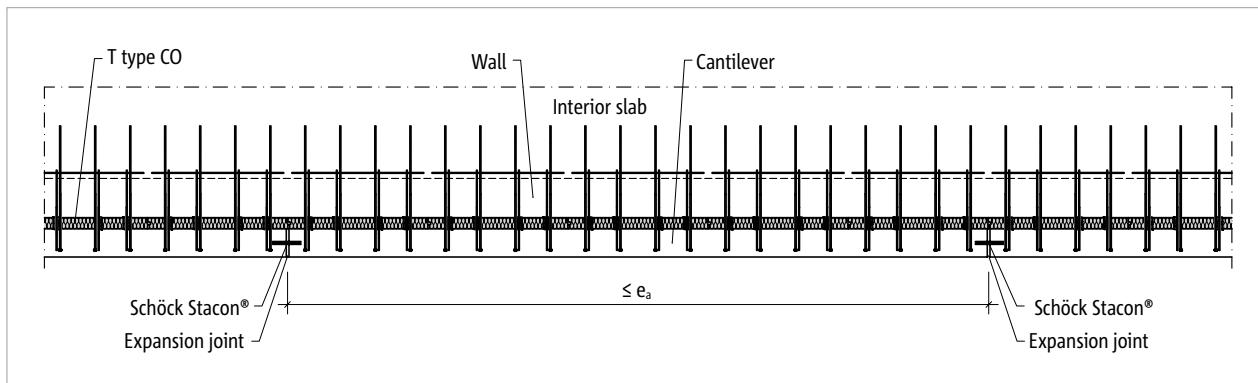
Schöck Isokorb® Type CO: Maximum expansion joint spacing
